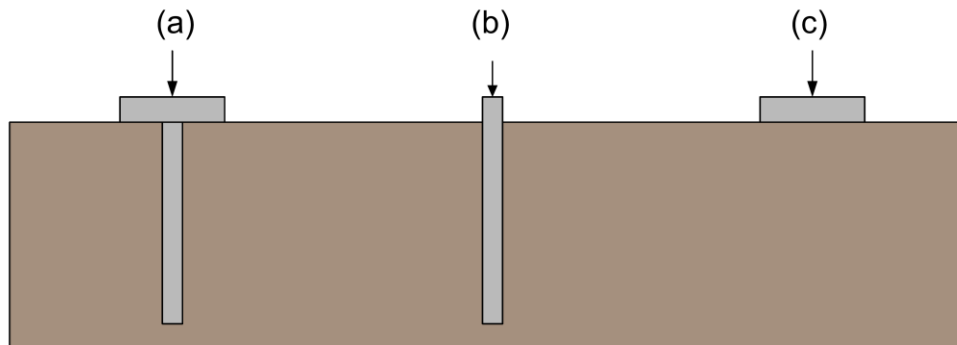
Different types of foundation that are tested in this study (a) single piled raft unit, (b) Single pile, (c) shallow footing
